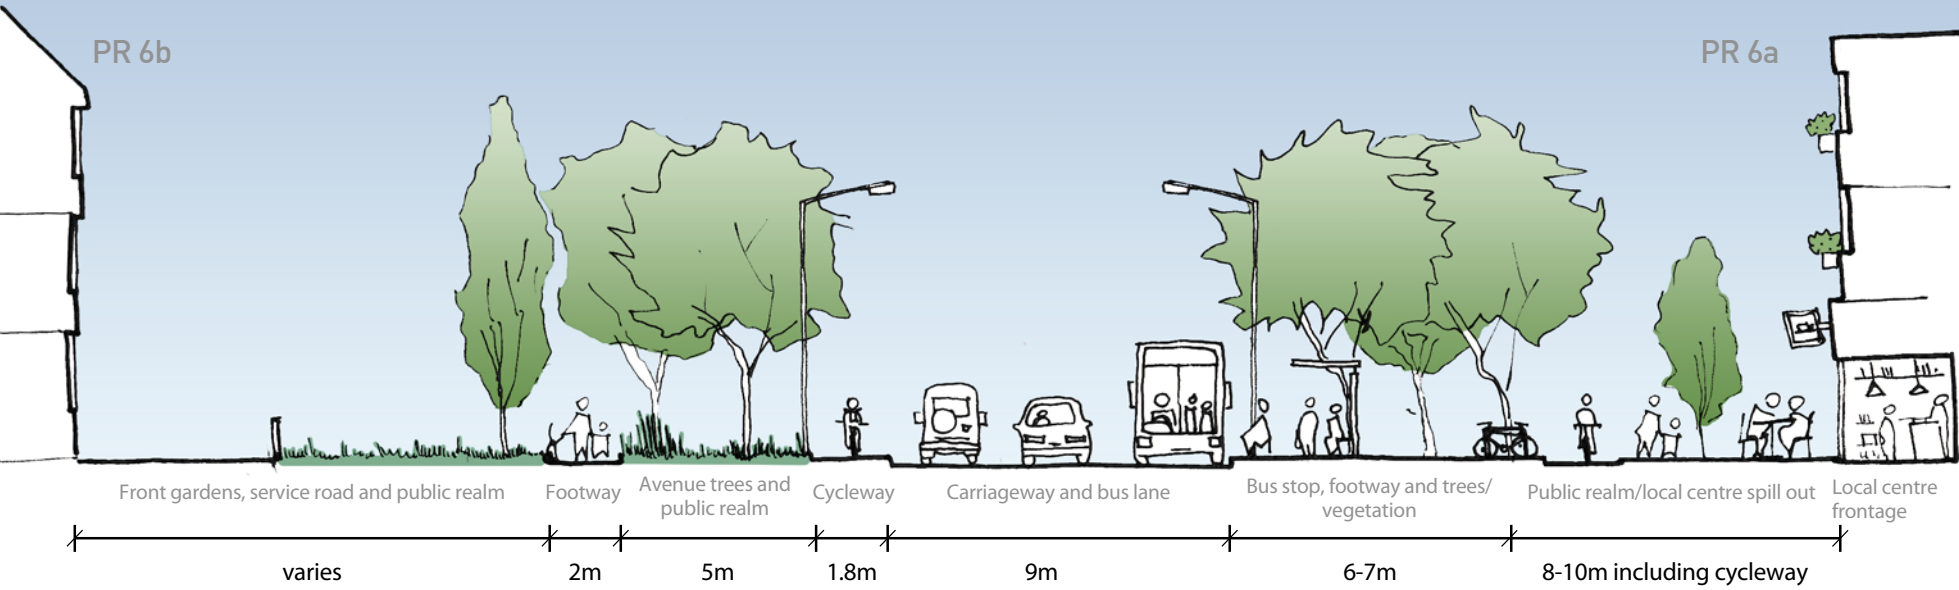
A-A – indicative proposals for improvements to Oxford Road showing relationship to PR6b and PR6b frontages (subject to final Oxford Road design by OCC).
